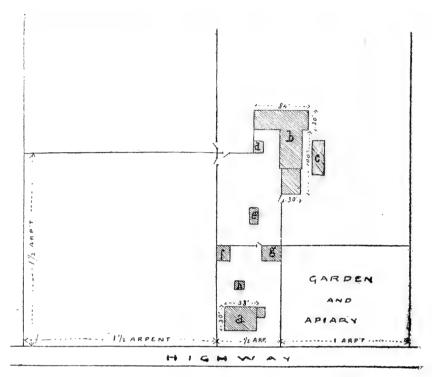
Horizontal plan of Mr. J. O. Levac's farm buildings.
